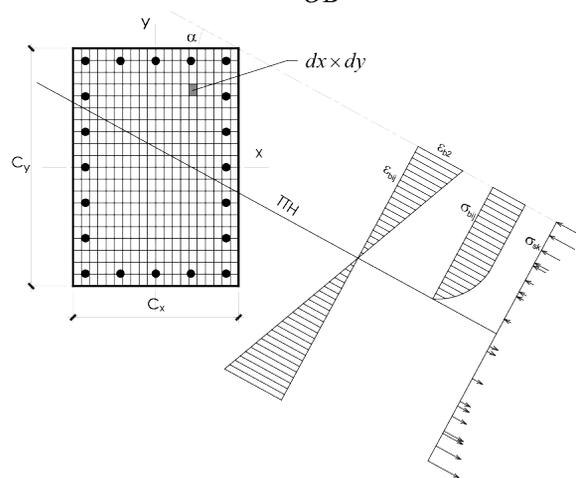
Stress–strain diagram of concrete and reinforcing steel elements
